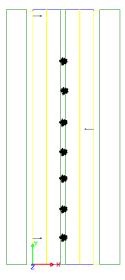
Plan view sketch of urban boulevard lined with trees and historical-appearing luminaires.
